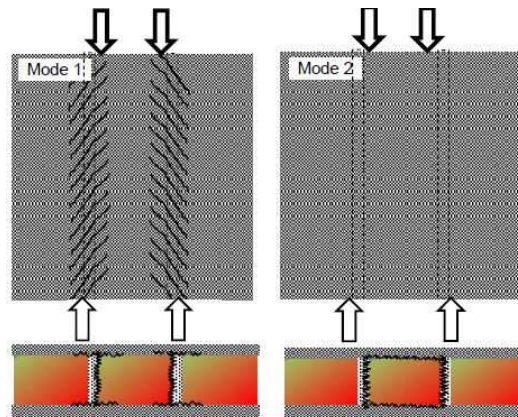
Failure modes corresponding to retrofitted masonry triplets [38].
